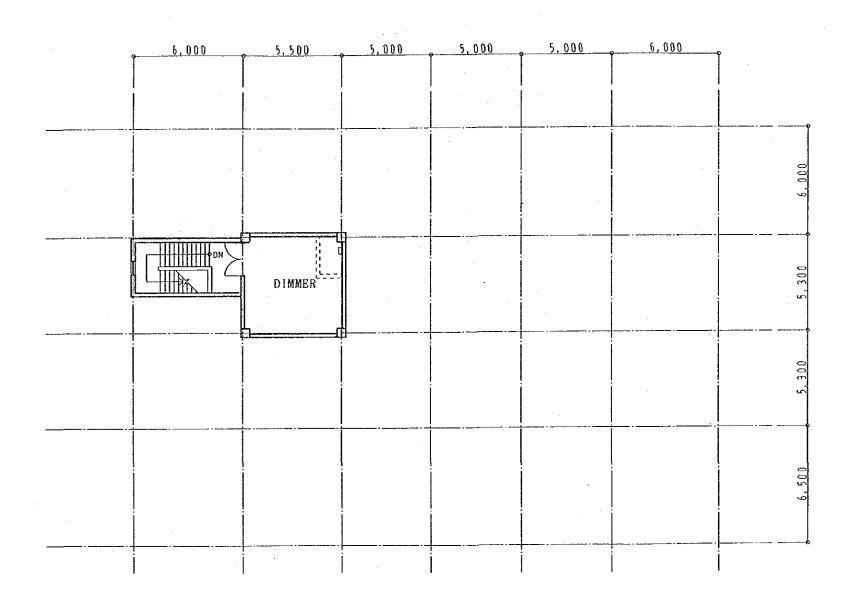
FIRST FLOOR PLAN, SCALE 1:200
